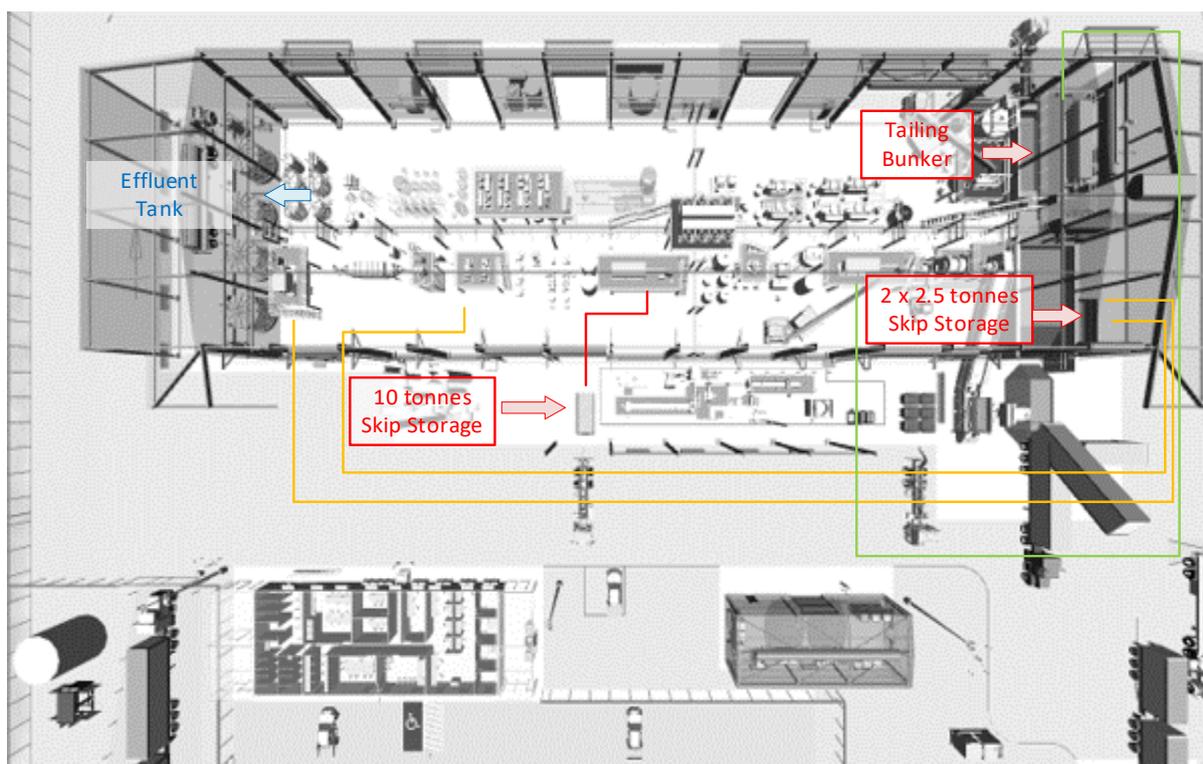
QRCUF Site Layout – On-Site Waste Movements
